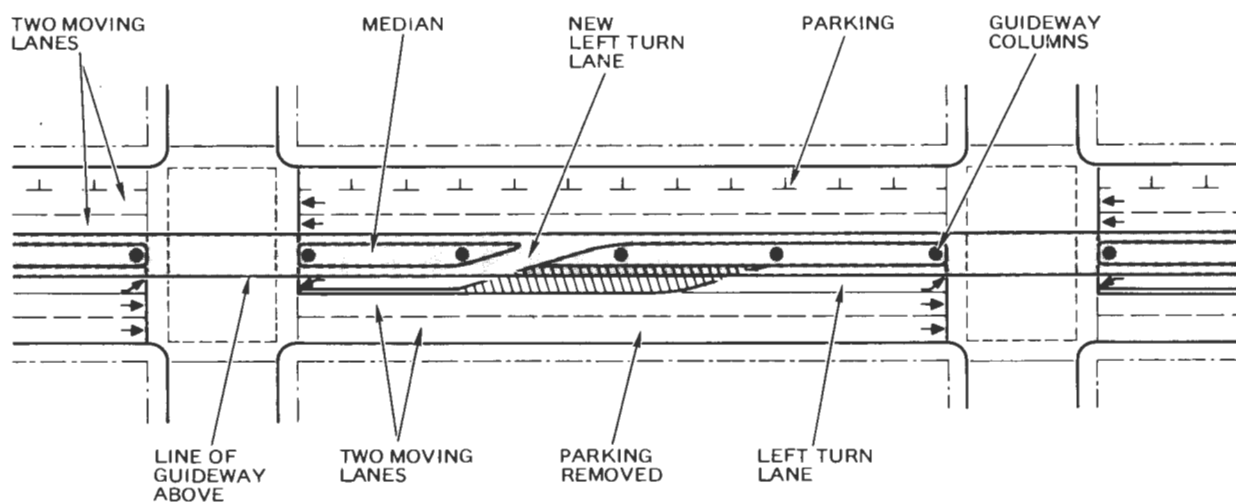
Arterial Street – Plan View of Aerial Guideway Columns and Median
